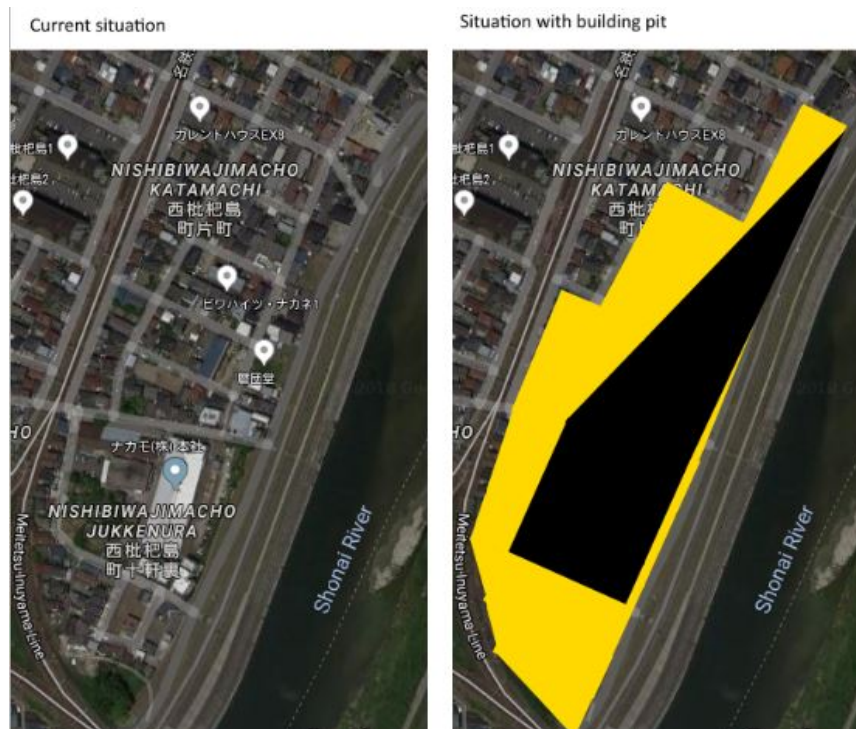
Area of building site Inlet. Left: current situation; Right: Situation with building pit; Black: Future structure; Yellow: Construction site
